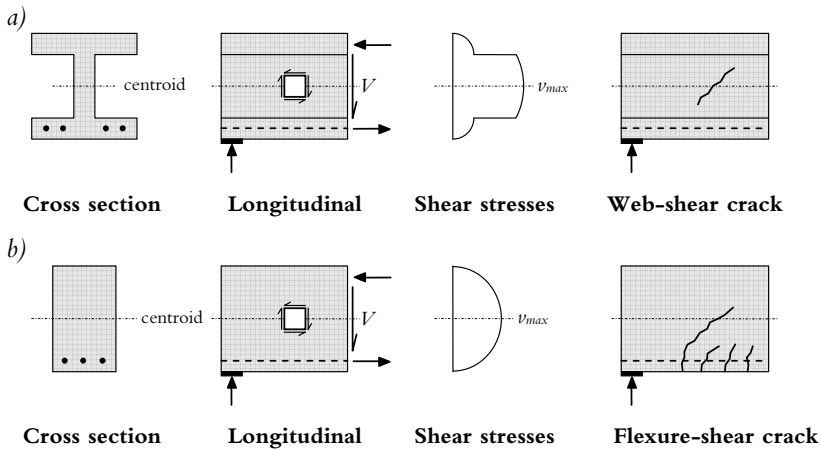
Types of diagonal cracking. a) Web-shear cracking and b) Flexure-shear cracking.
